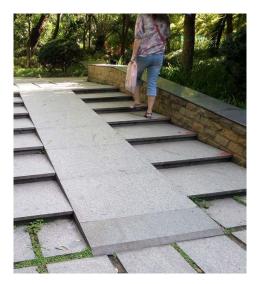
Example of Bike Ramp – Low Stair Profile (Pinterest photo)
